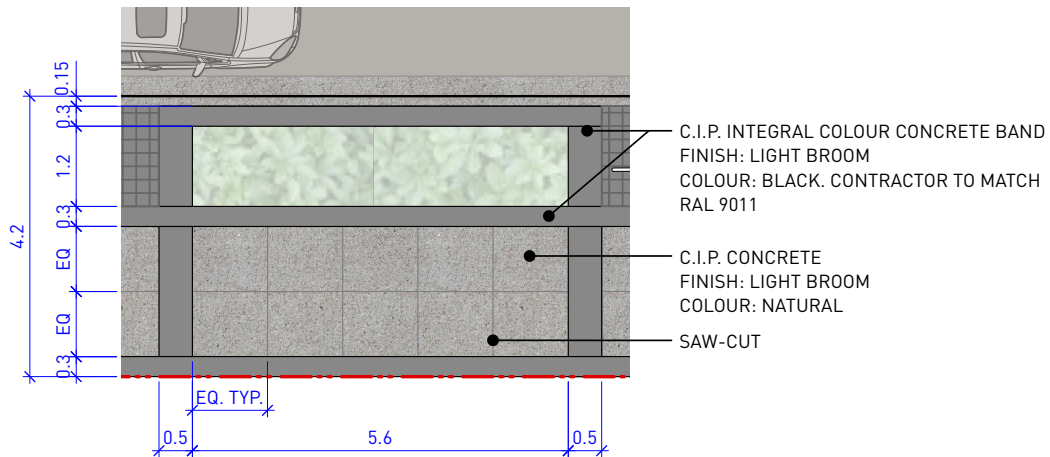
ENLARGEMENT 3 - PAVING AROUND PLANTER
